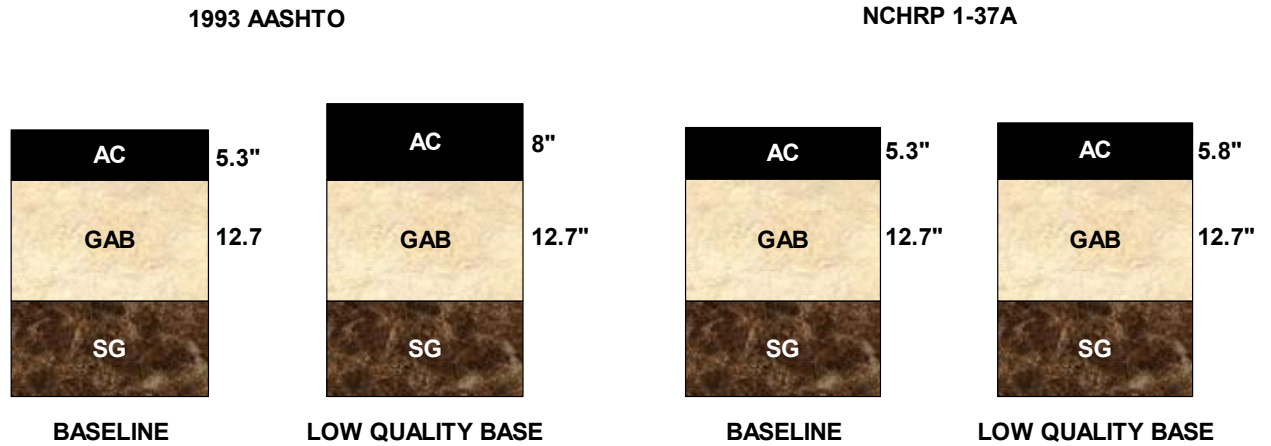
Summary of flexible pavement sections: low quality base scenario.
